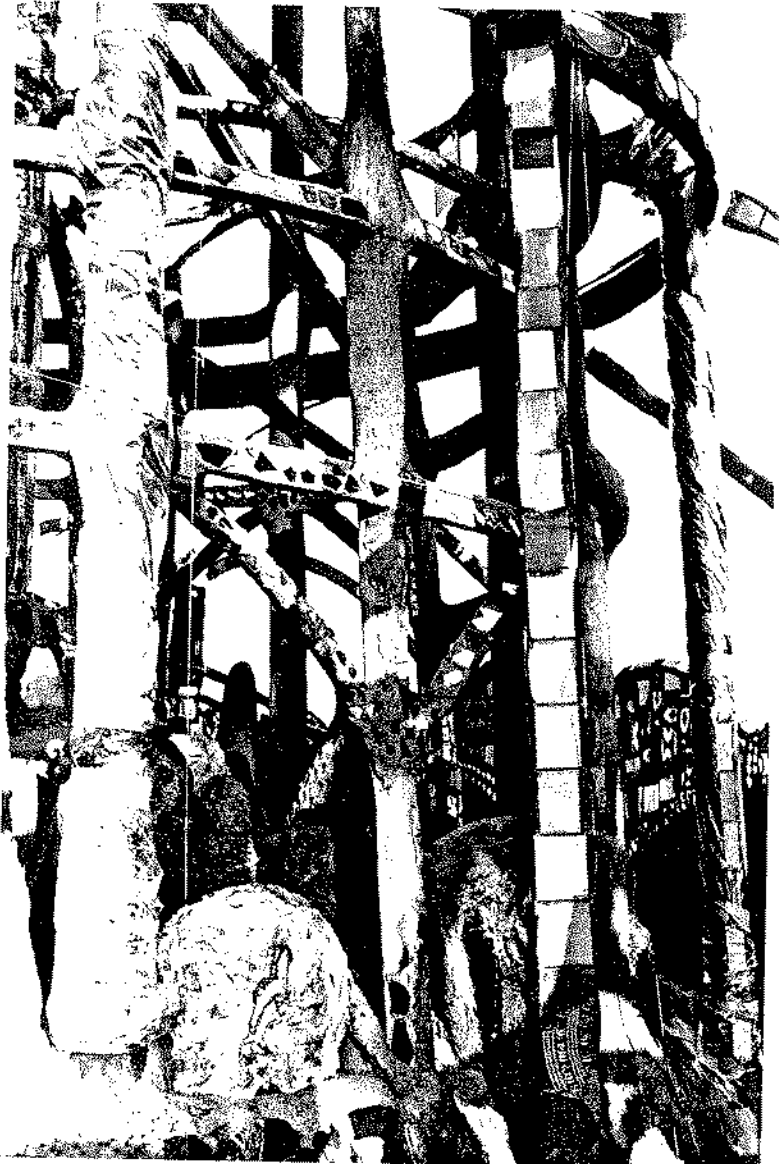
Center Tower showing some of nine support columns wrapped with plastic to impede rain water intrusion into large cracks in mortar. 1/11/93 photo.
